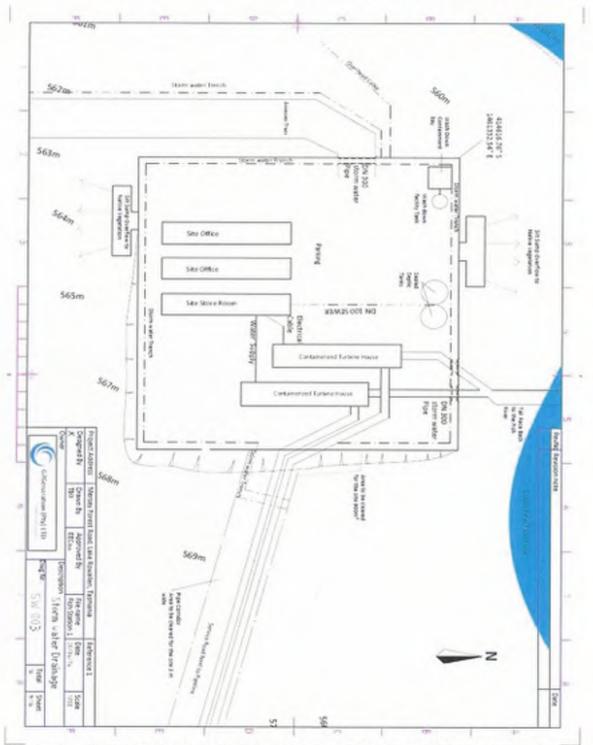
Site plan of proposed Fish River power station illustrating infrastructure and stormwater design.
